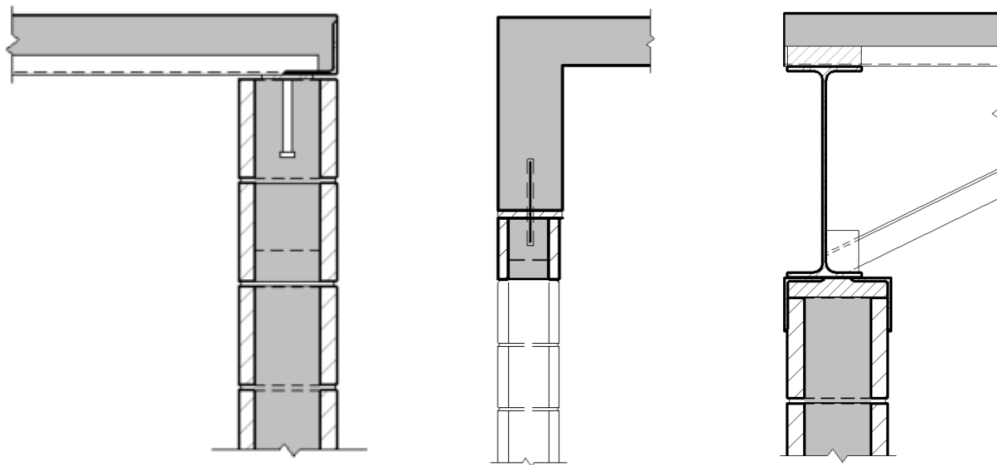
Examples of Typical Eccentricities in Buildings
